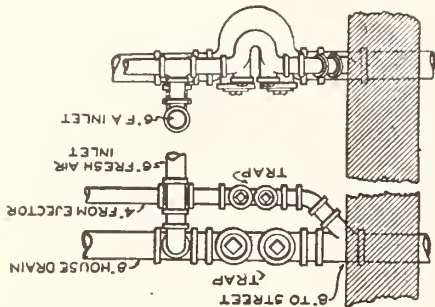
Arrangement of Main Running Traps on Drainage System in the Æolian Building.
